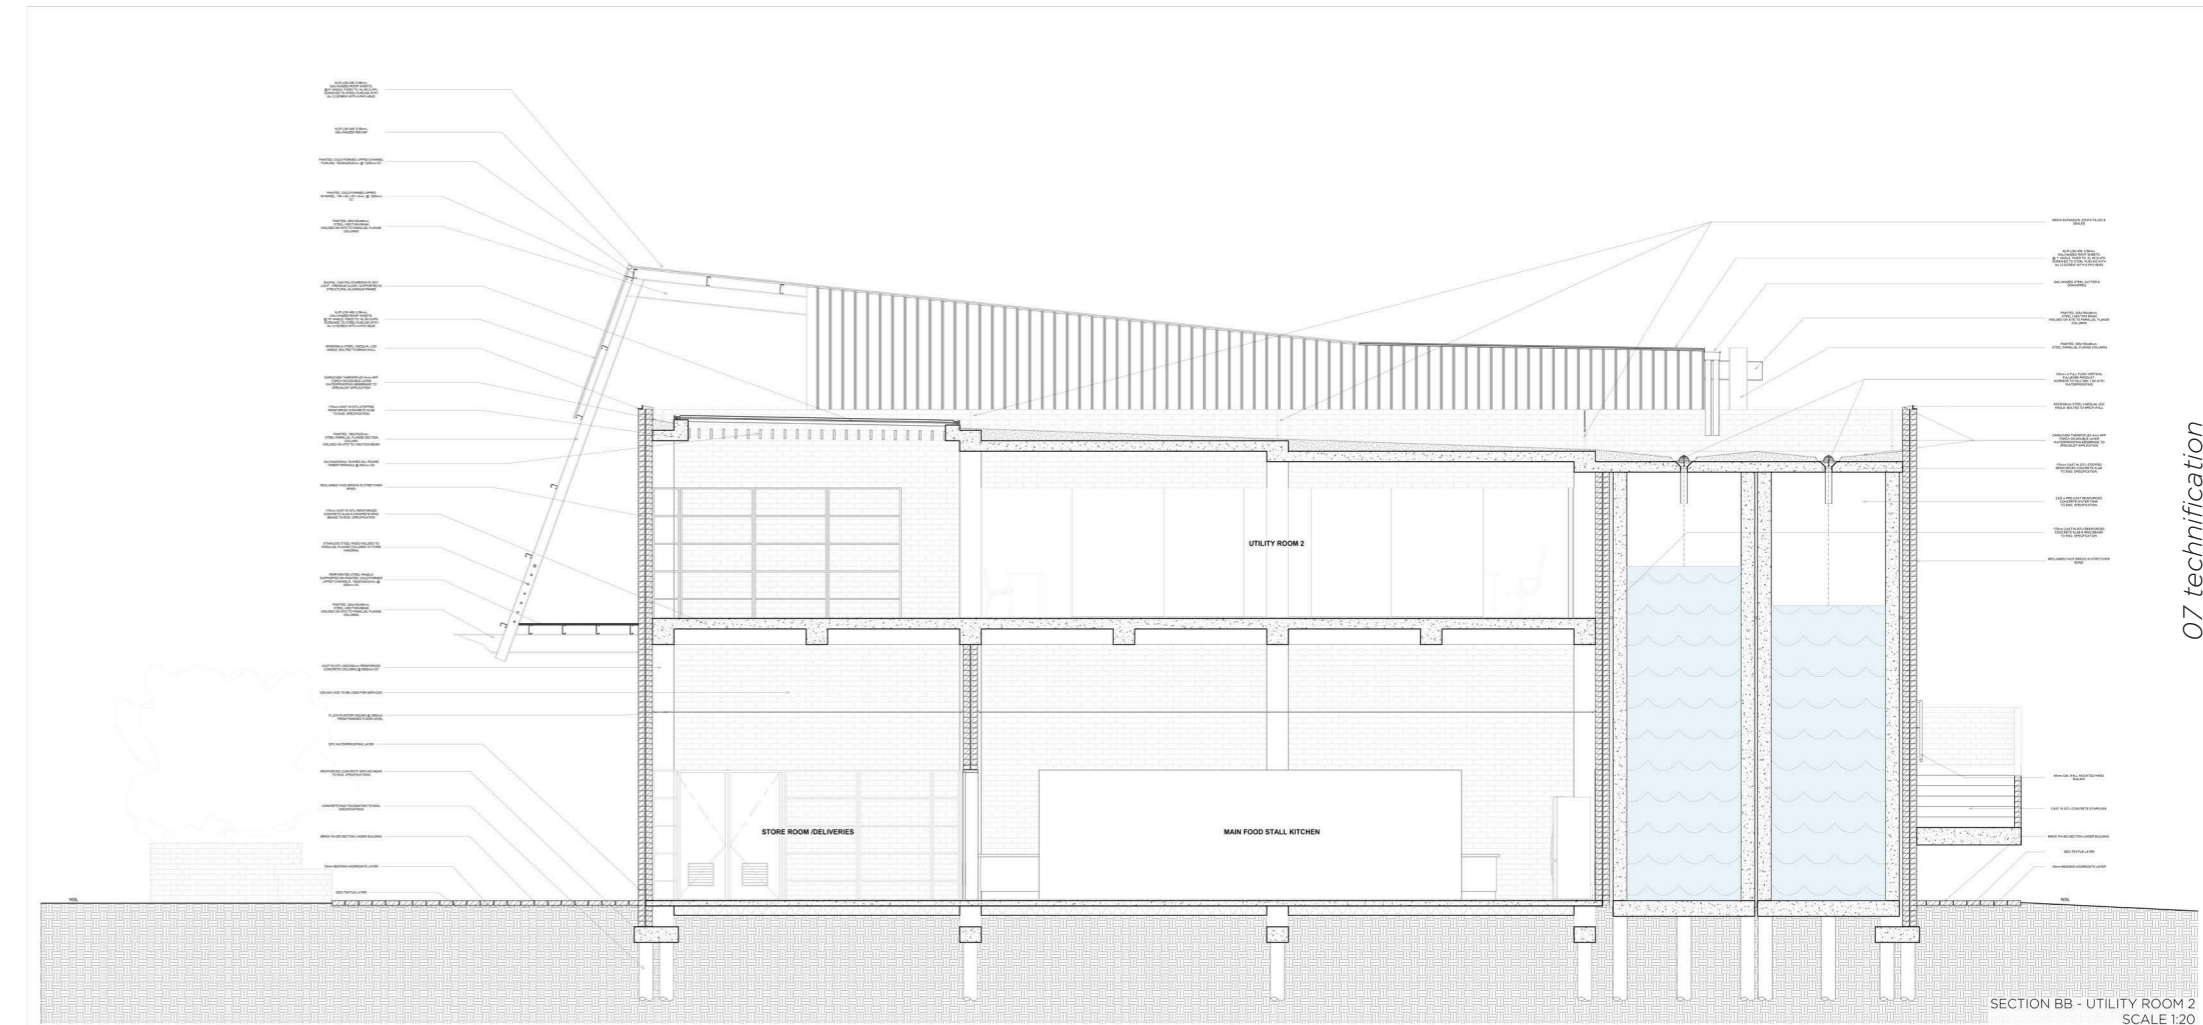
September Crit section - BB through Brick box (Author, 2018)
